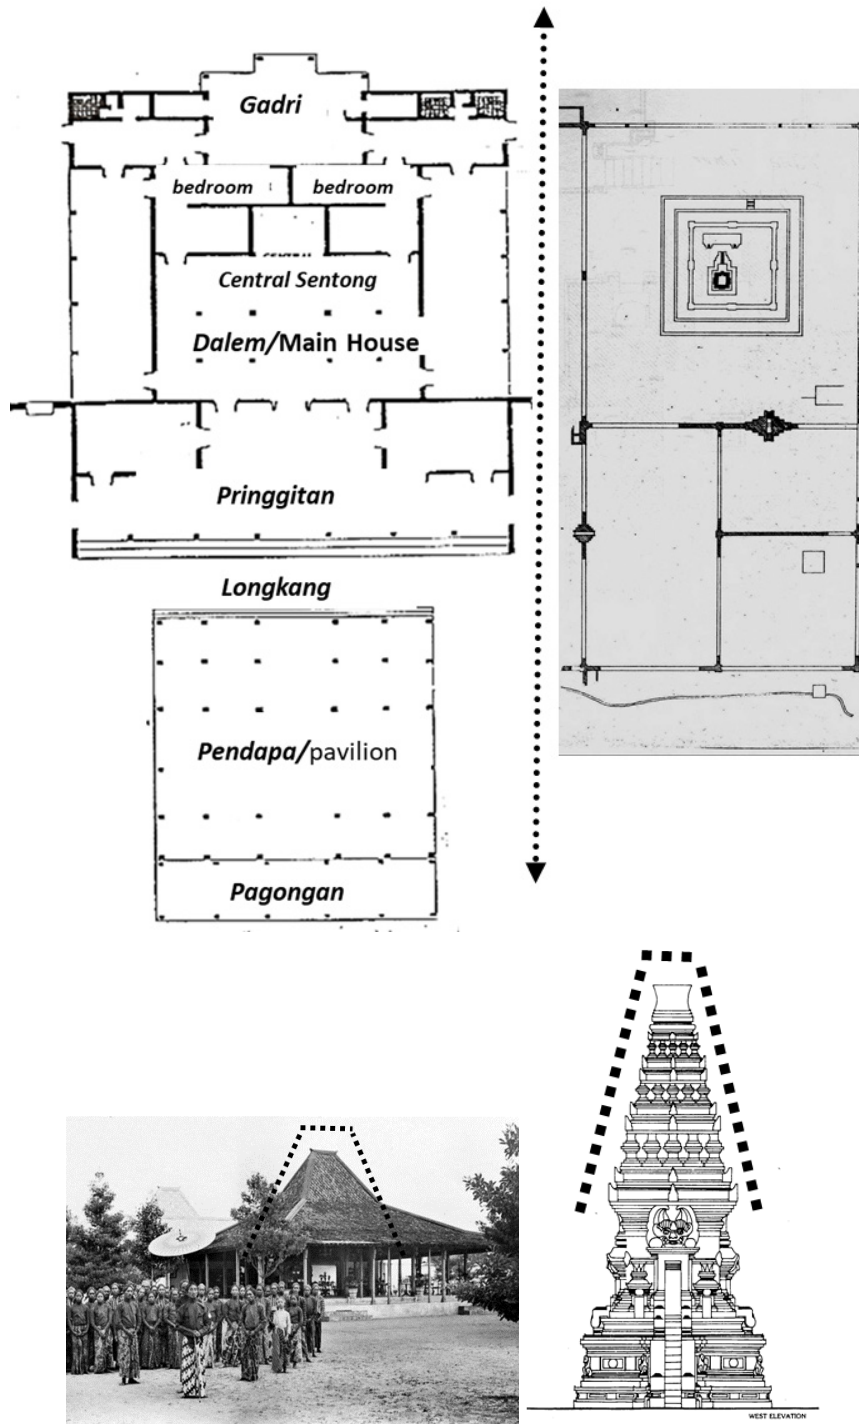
Linearity-Layout of *nDalem –Pendopo* and their roof with *Joglo* (left); Layout and Shape of Majapahit Temple (right)[14][15]
